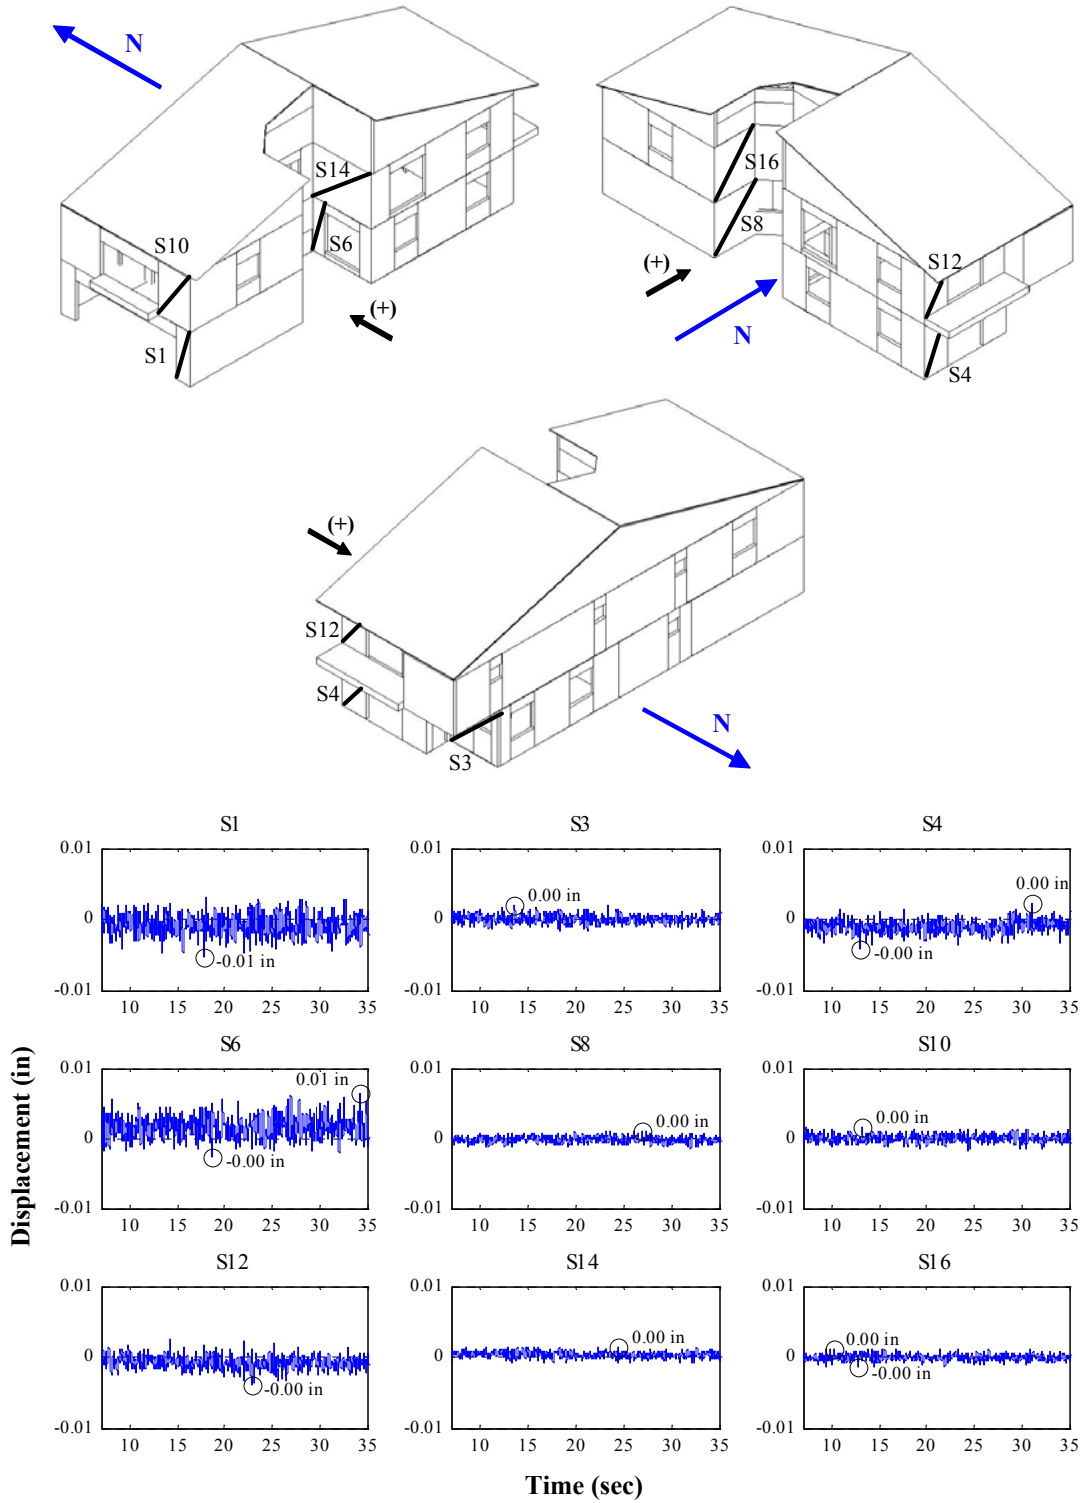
Wall deformations of north-south external walls for Test NWP2S08
